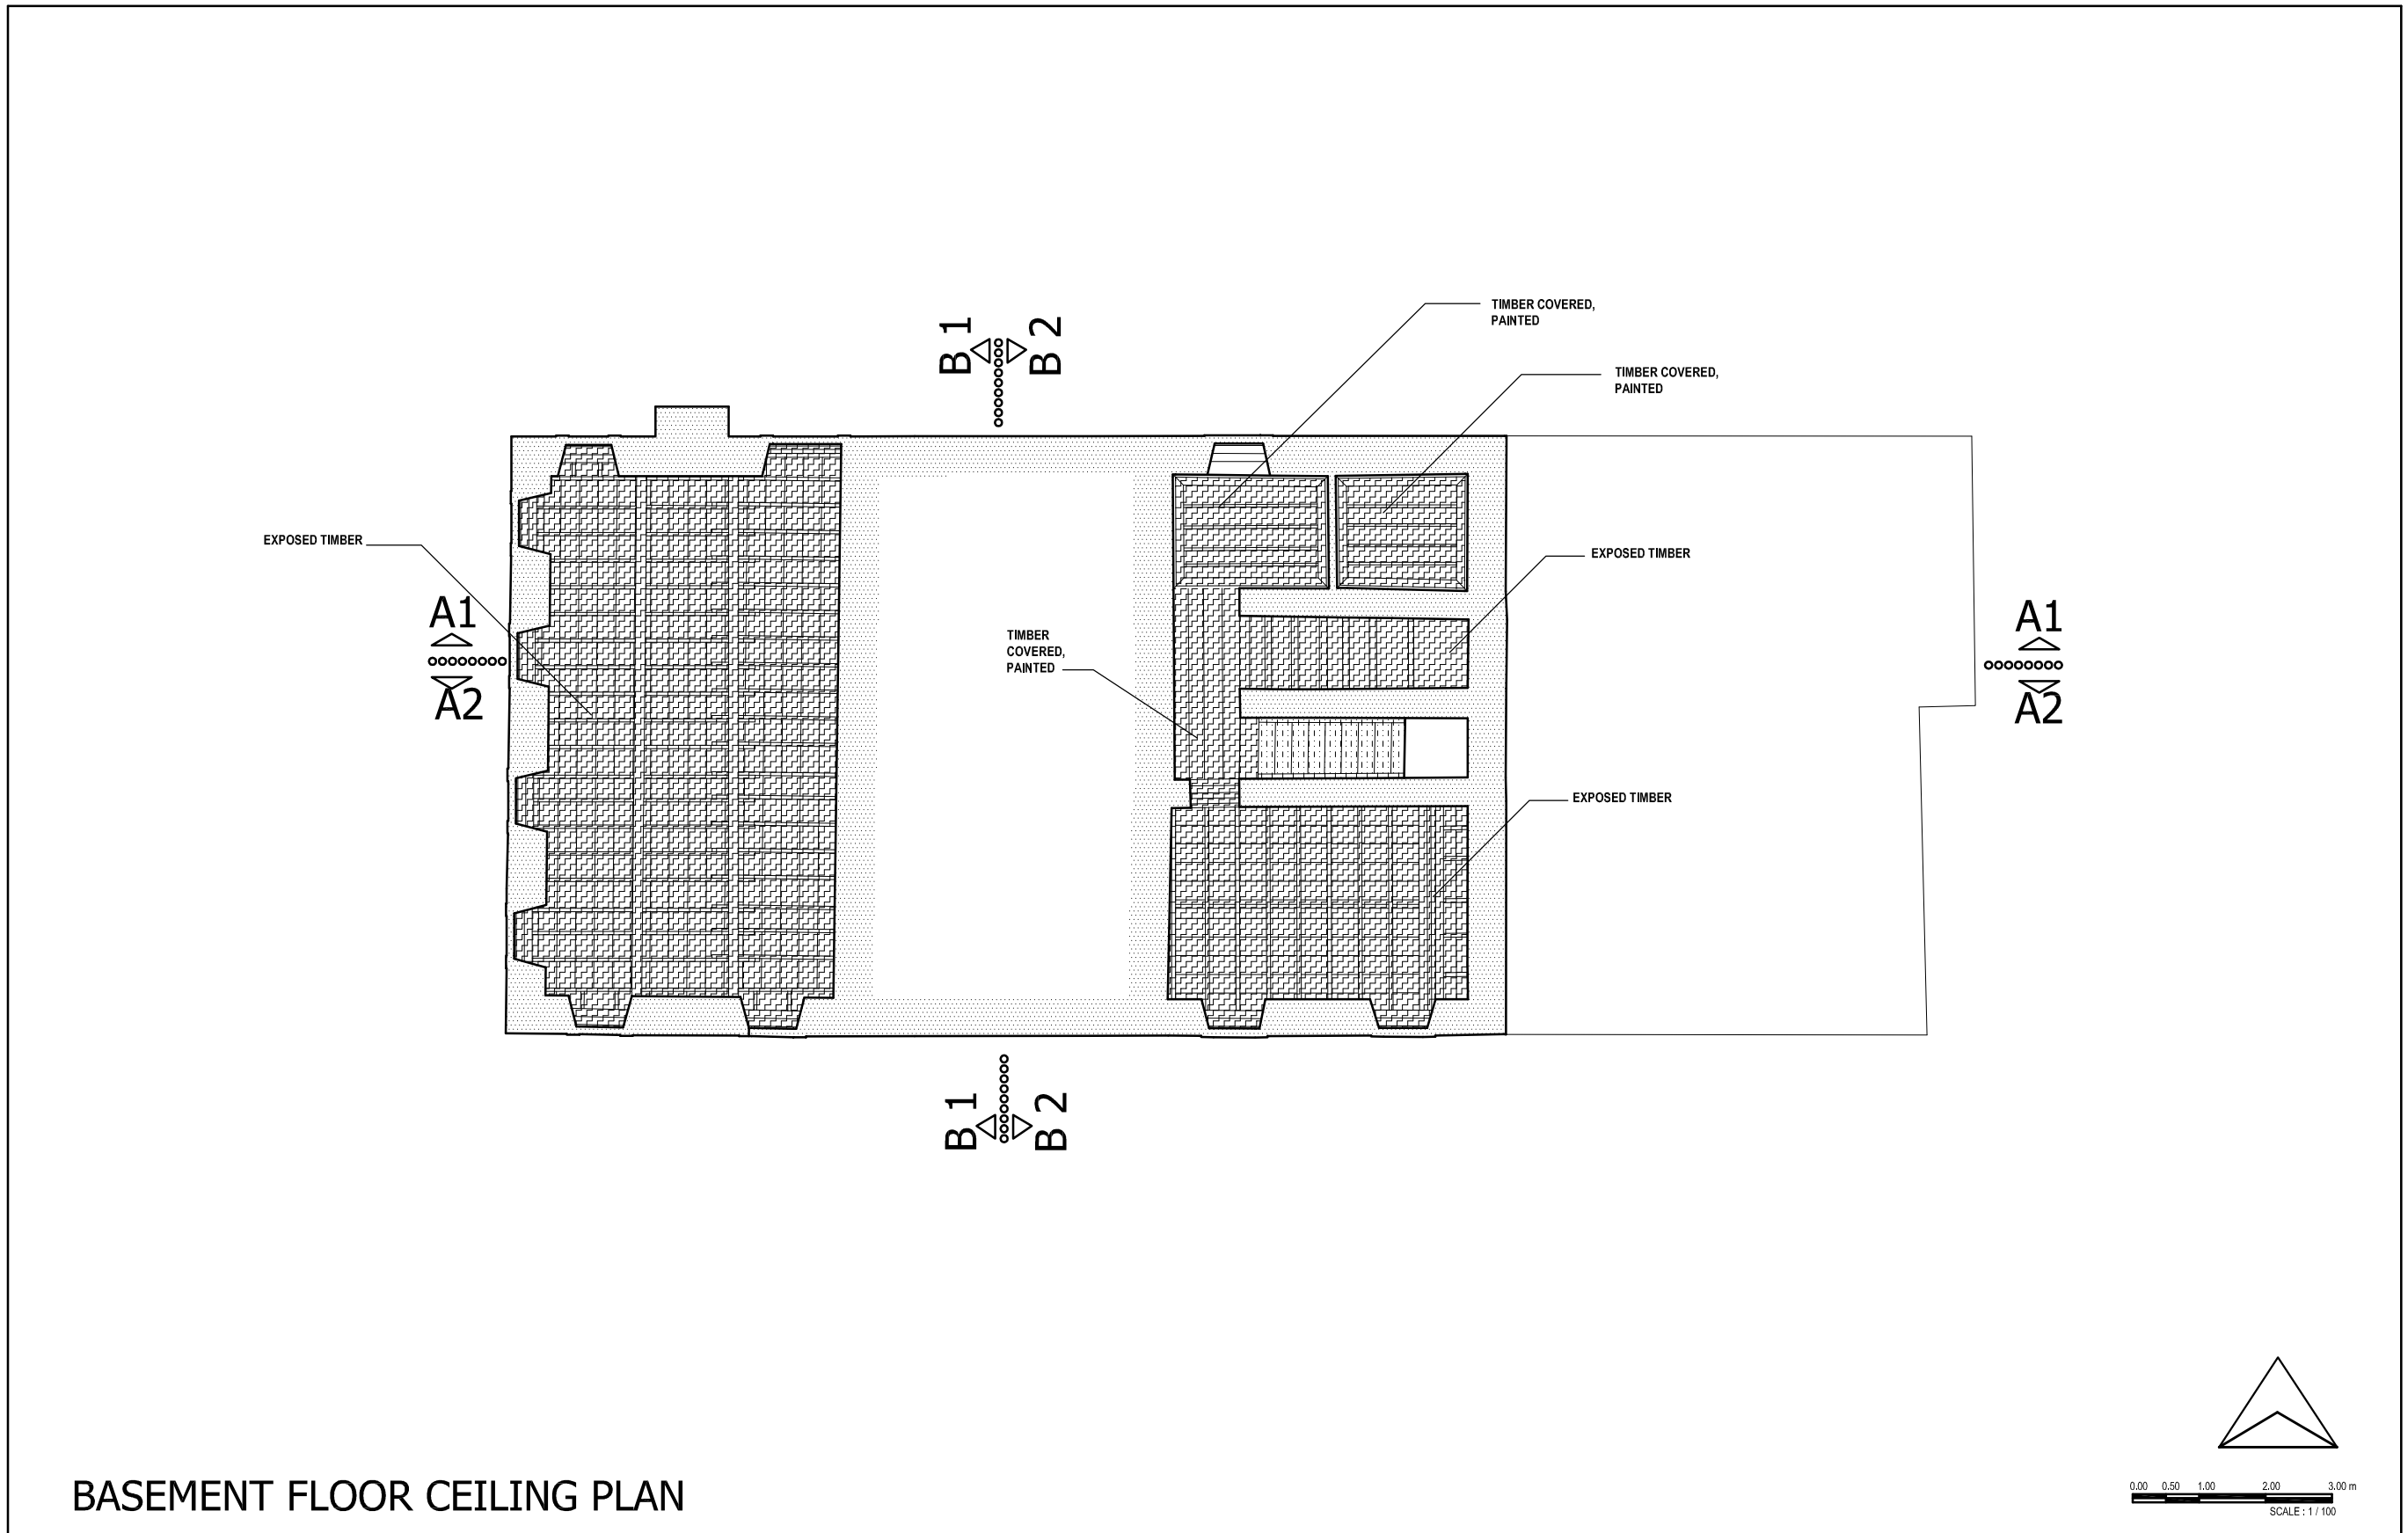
Analysis of Structural Characteristics - Basement Floor Plan
